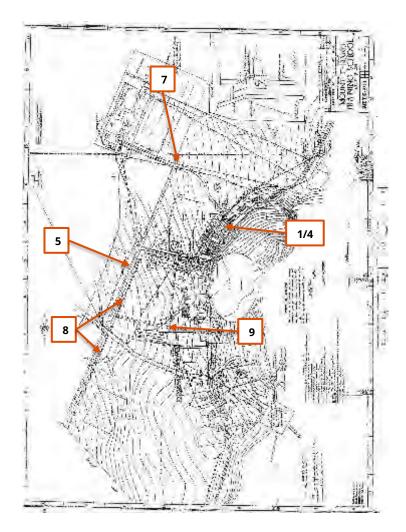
1946 site plan of the Mount Penang Training School, showing The Avenue [4], Parklands Road [5], McCabe Road [7], Parklands Road plantings [8] and Carinya Street plantings [9] (Source: (NSW Department of Public Works and Services, reproduced in GML 2001, pp. 22)
